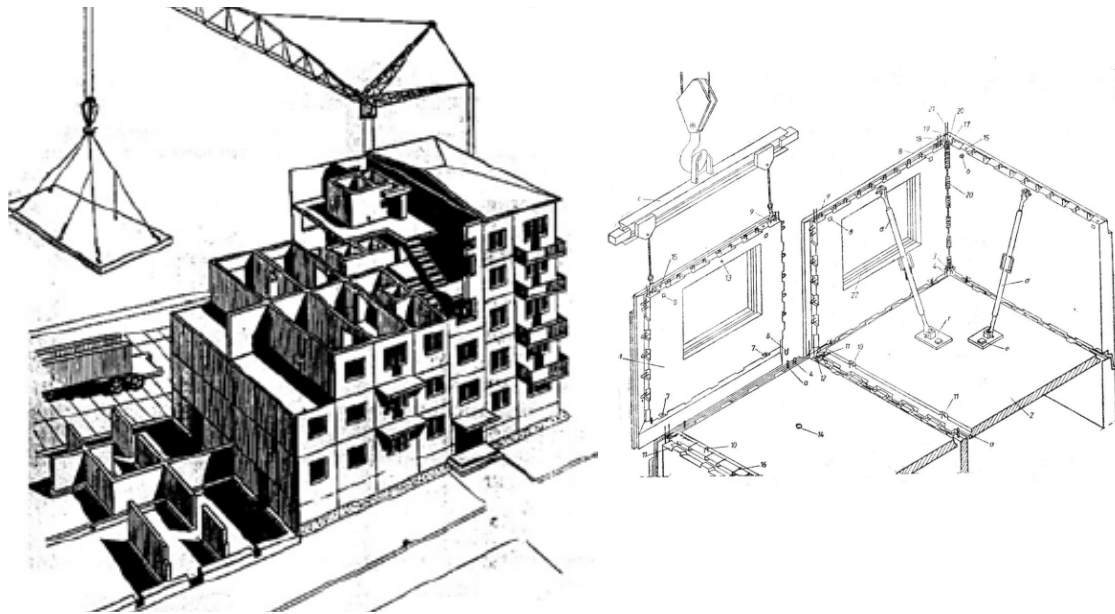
A large-panel concrete building under construction (Brzev & Guevara-Perez, 2011) and scheme of assembling of panels.
